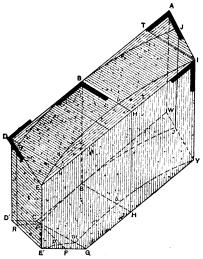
Application of Bevels and Face Mold, Second Method of Squaring Up the Plank; Also Oblique Projection of Mold Shown in Fig. 41.
